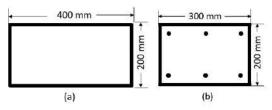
(a) Block module for column assembly and (b) Plan of RCC column
